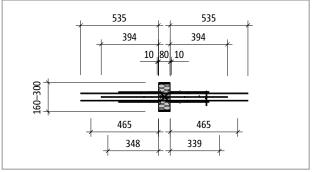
Schöck Isokorb® T type W-M1: Product layout
